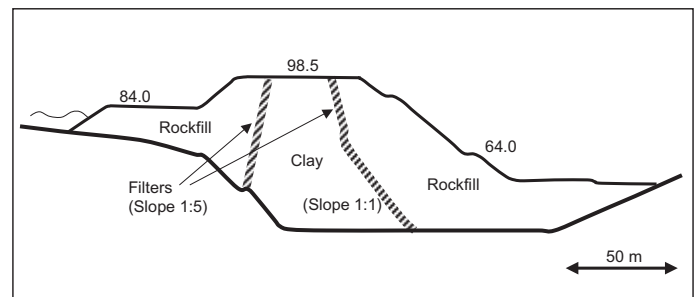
Tous Dam cross section. Vertical and horizontal scales are equal.
